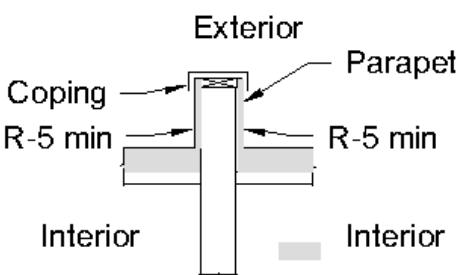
Parapet within field of roof (Section 5.5.5.1.3).
